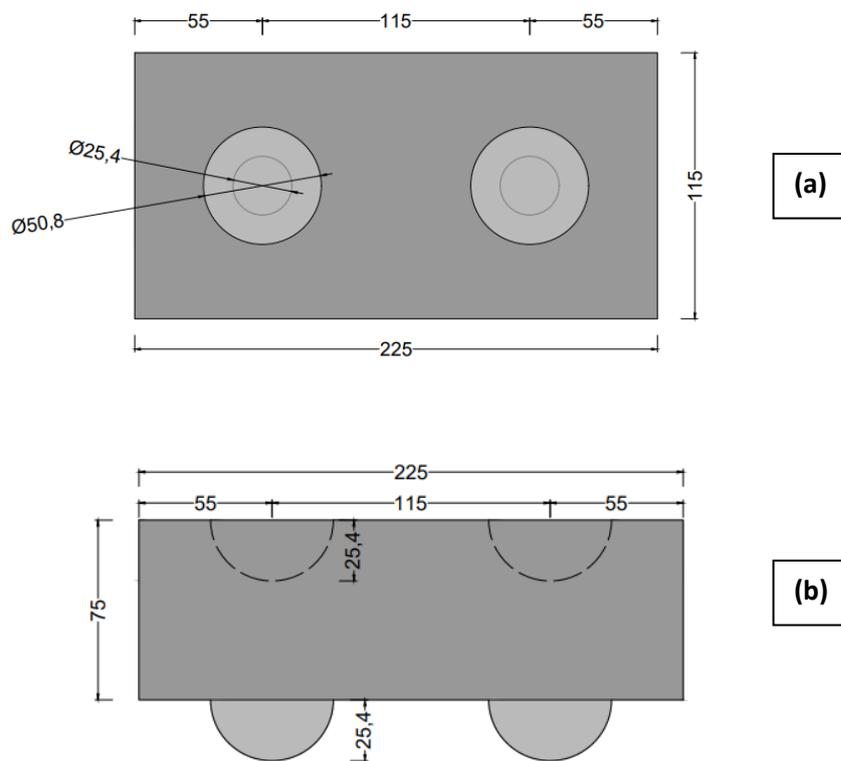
Dimensions of waste plastic interlocking brick (a) plan view (b) side view
